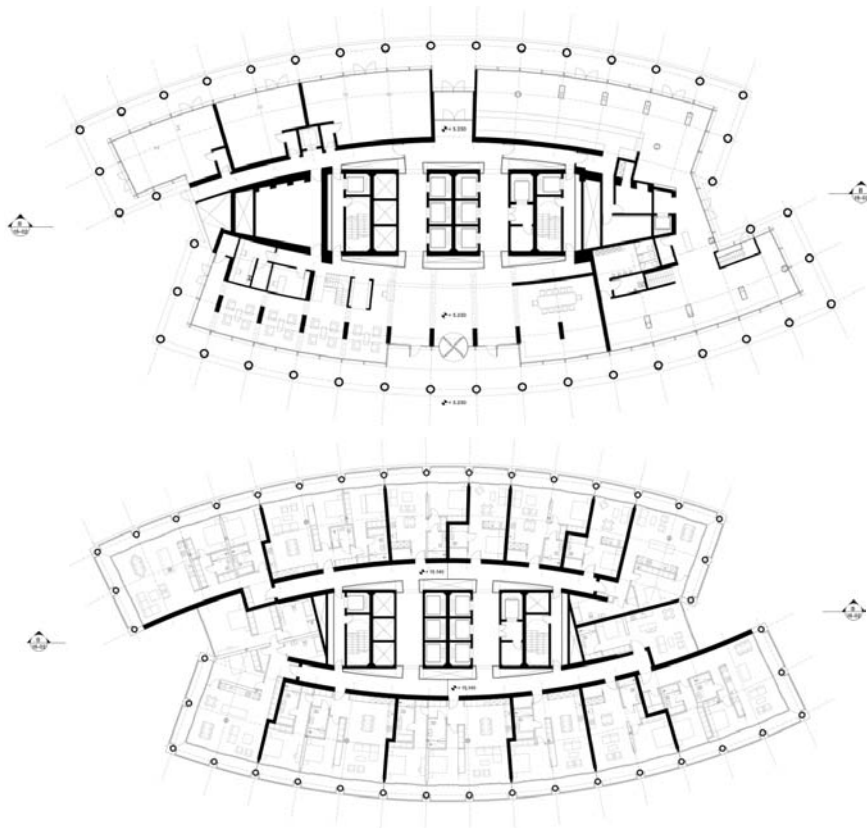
Portland House, Proposal, Ground Floor and Typical Floor Plan (DCA, 2013)
